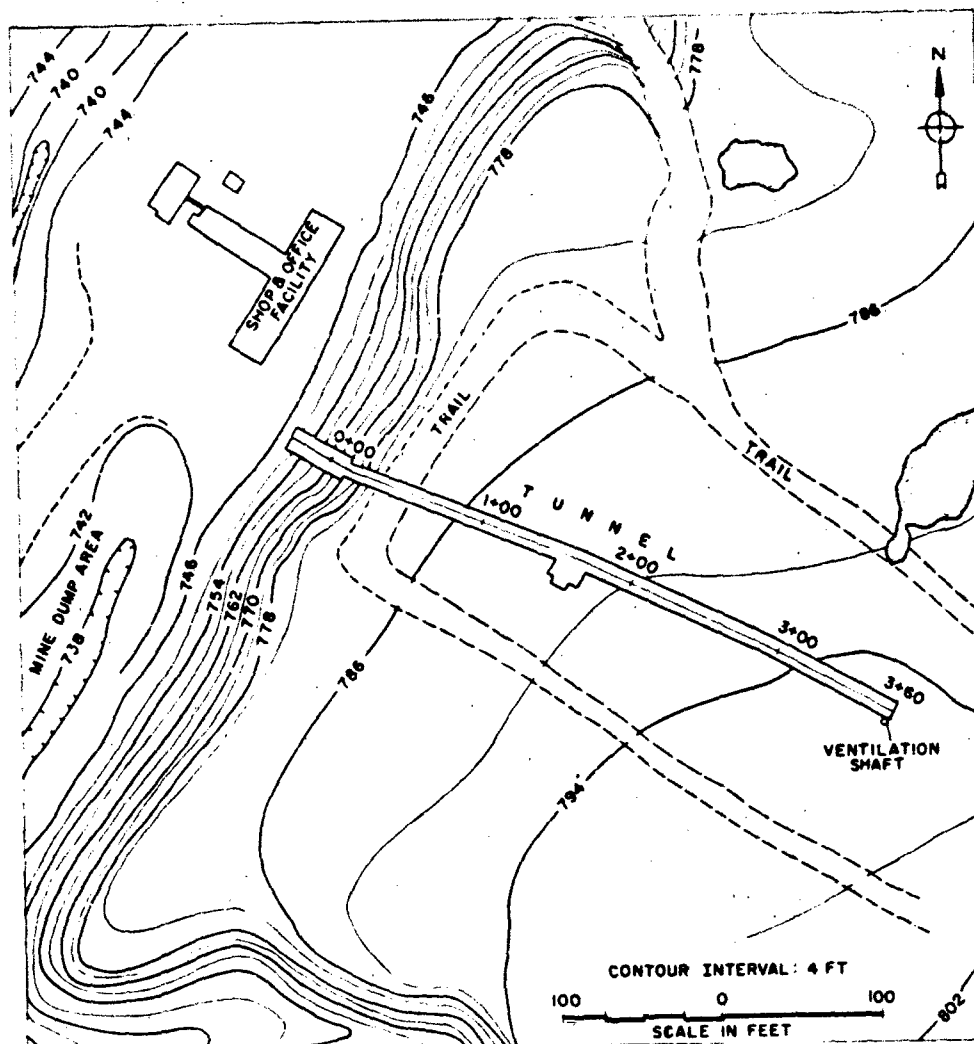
Topographic map of tunnel site with superimposed tunnel section.
